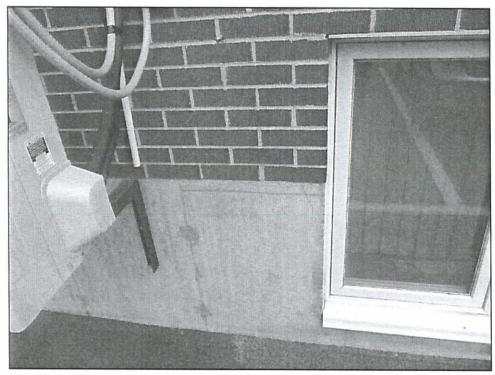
Minor Cracking Beside One Basement Window on North side of Addition
